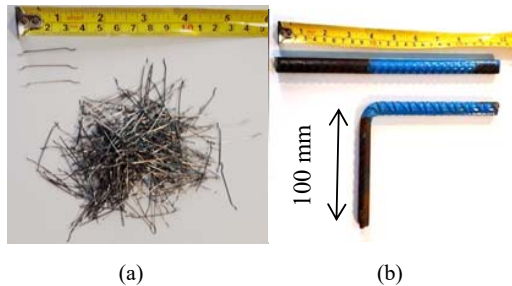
(a) Steel fiber, (b) preparation of steel reinforcement bars
